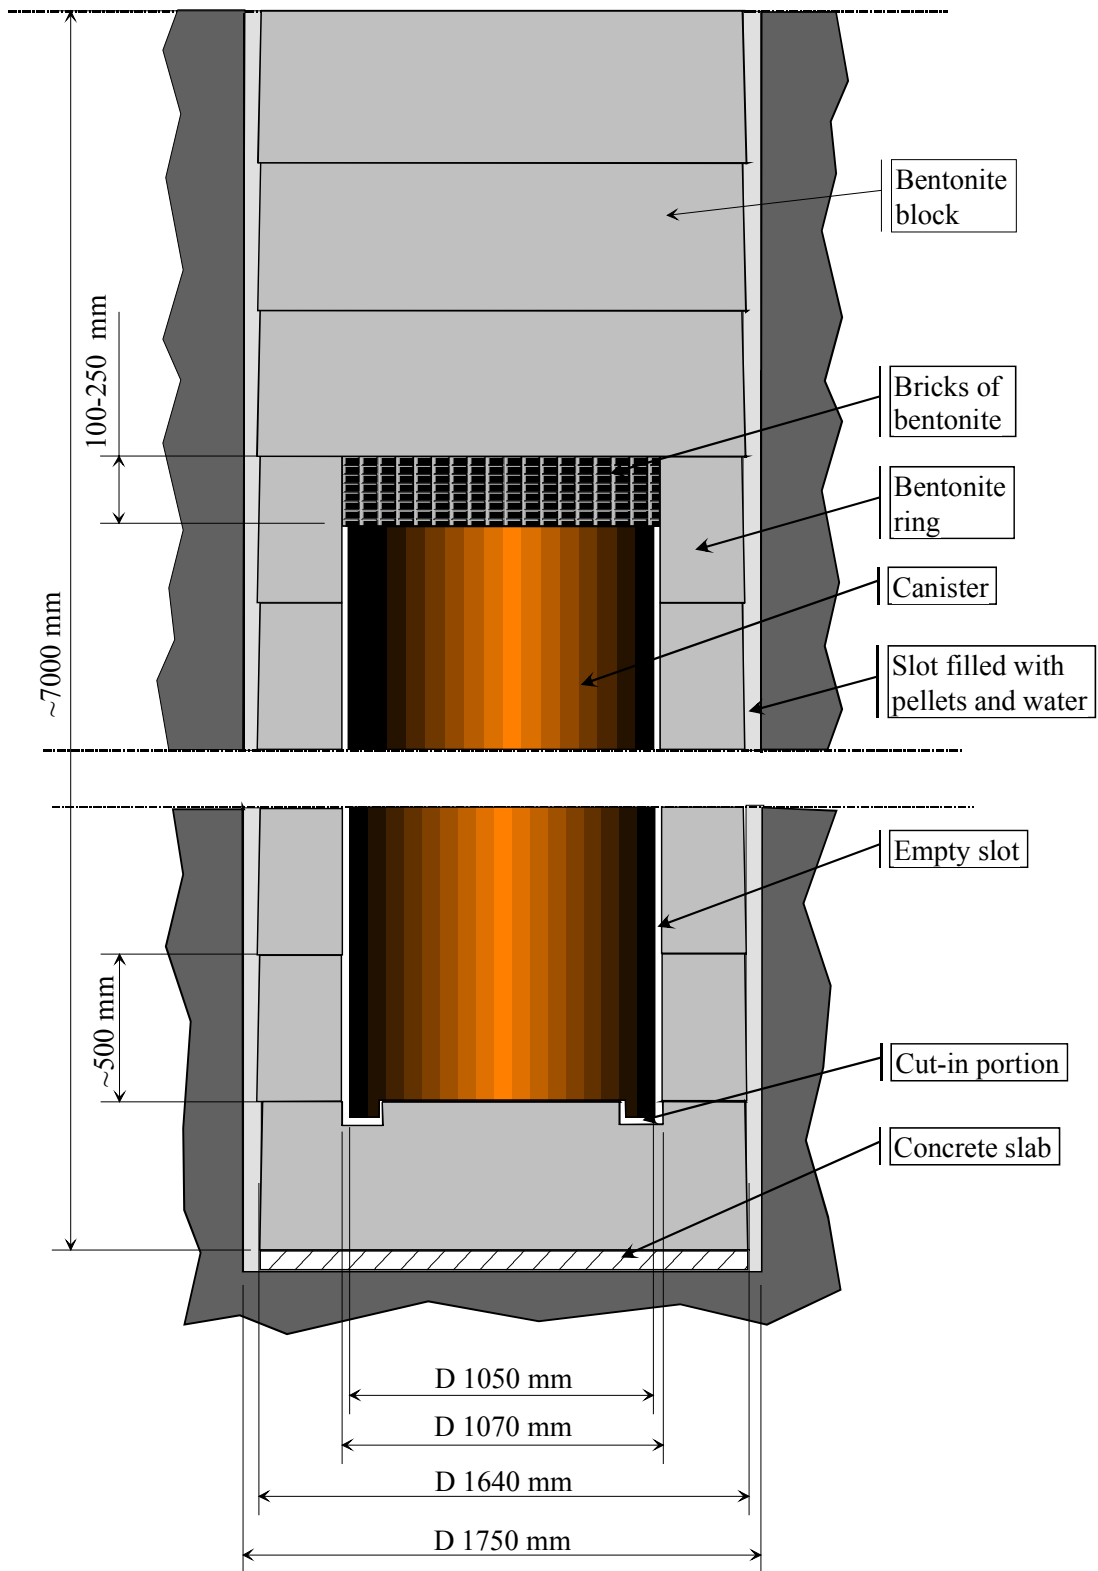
Schematic drawing of the canister hole with bentonite blocks with dimensions in mm.
